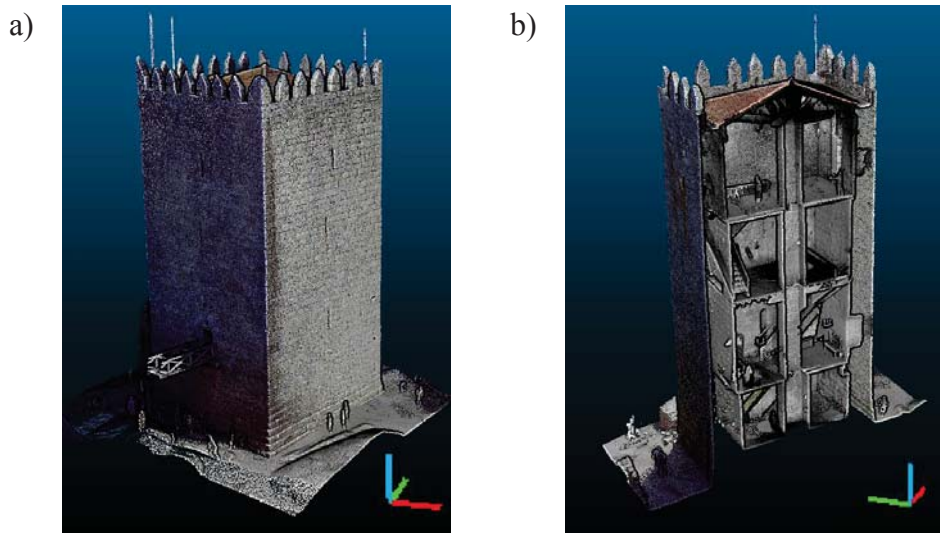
3D point cloud of the tower keep: a) exterior view; and b) section crossing the center of the tower.
